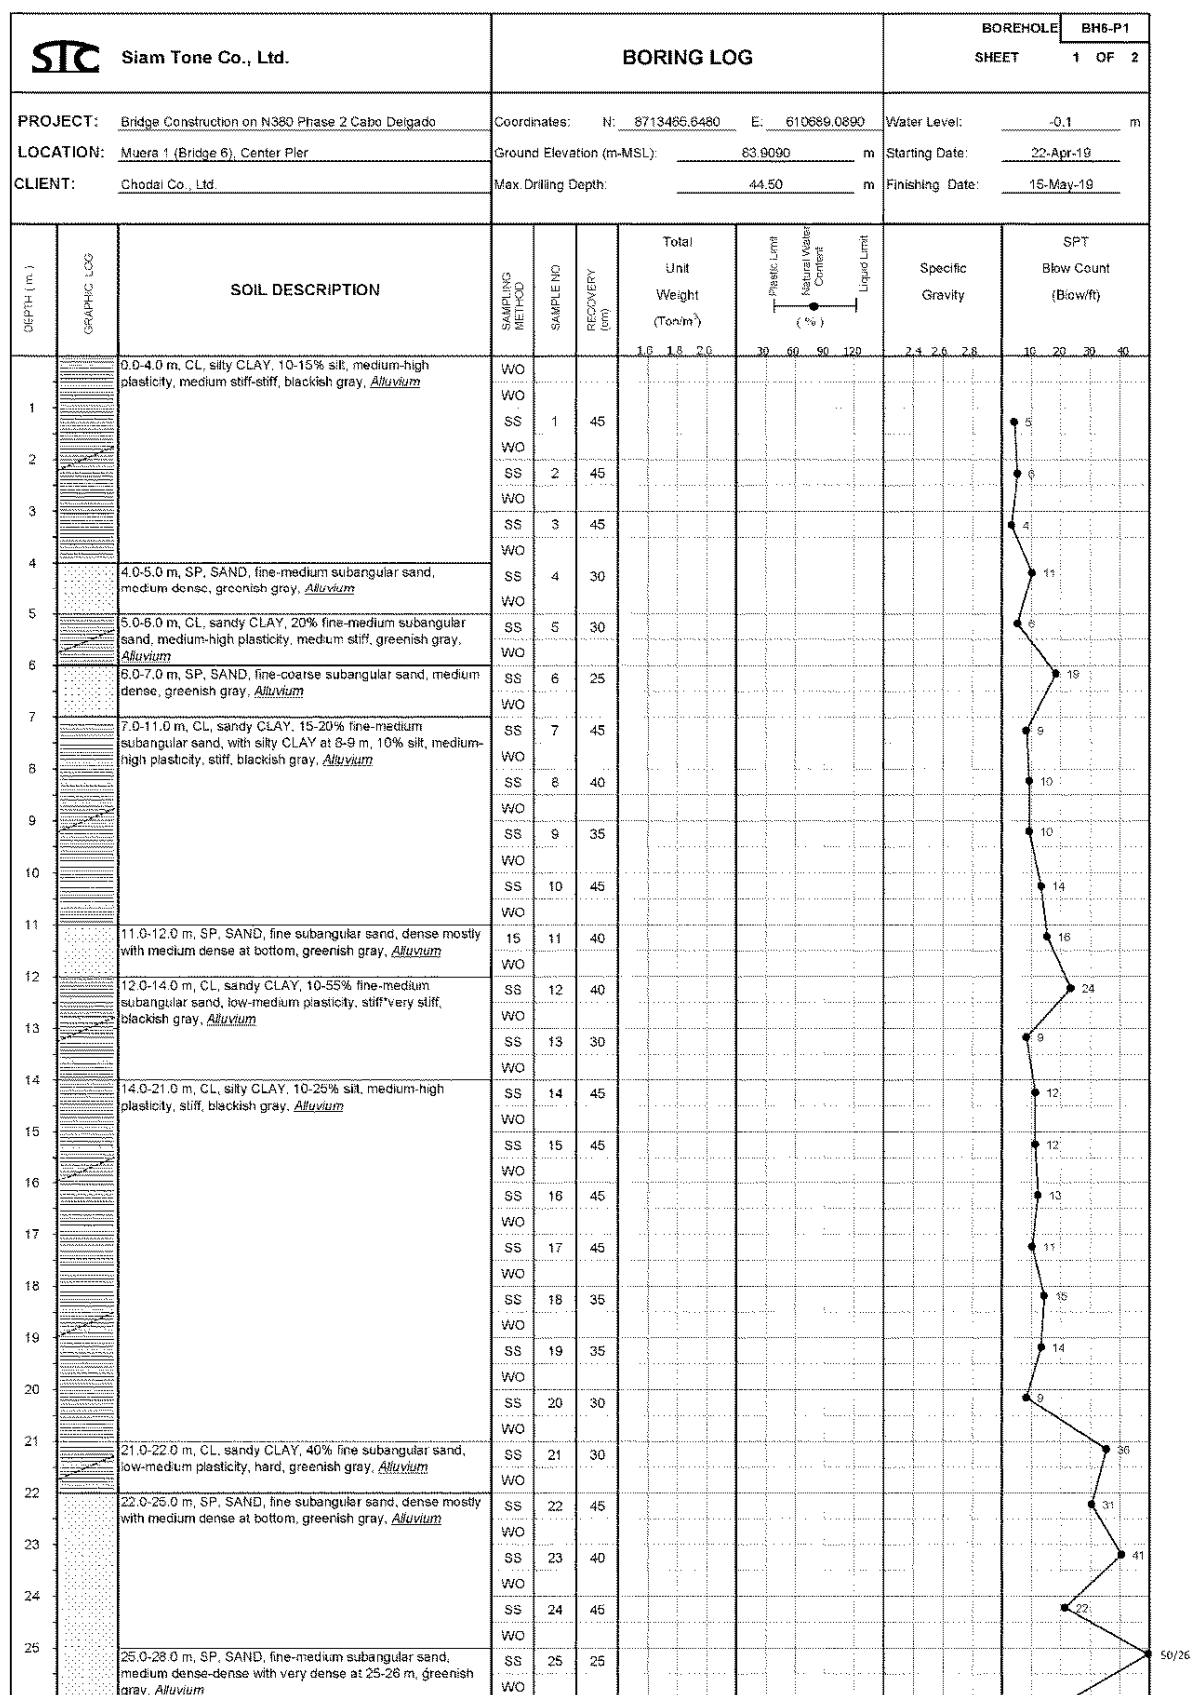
BH6-P1 at Central Pier of Muera I Bridge (B6)
